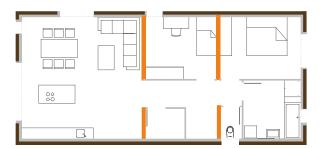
Floor plan of a flat in the conventional construction style Residential floor space of 100 m^2
